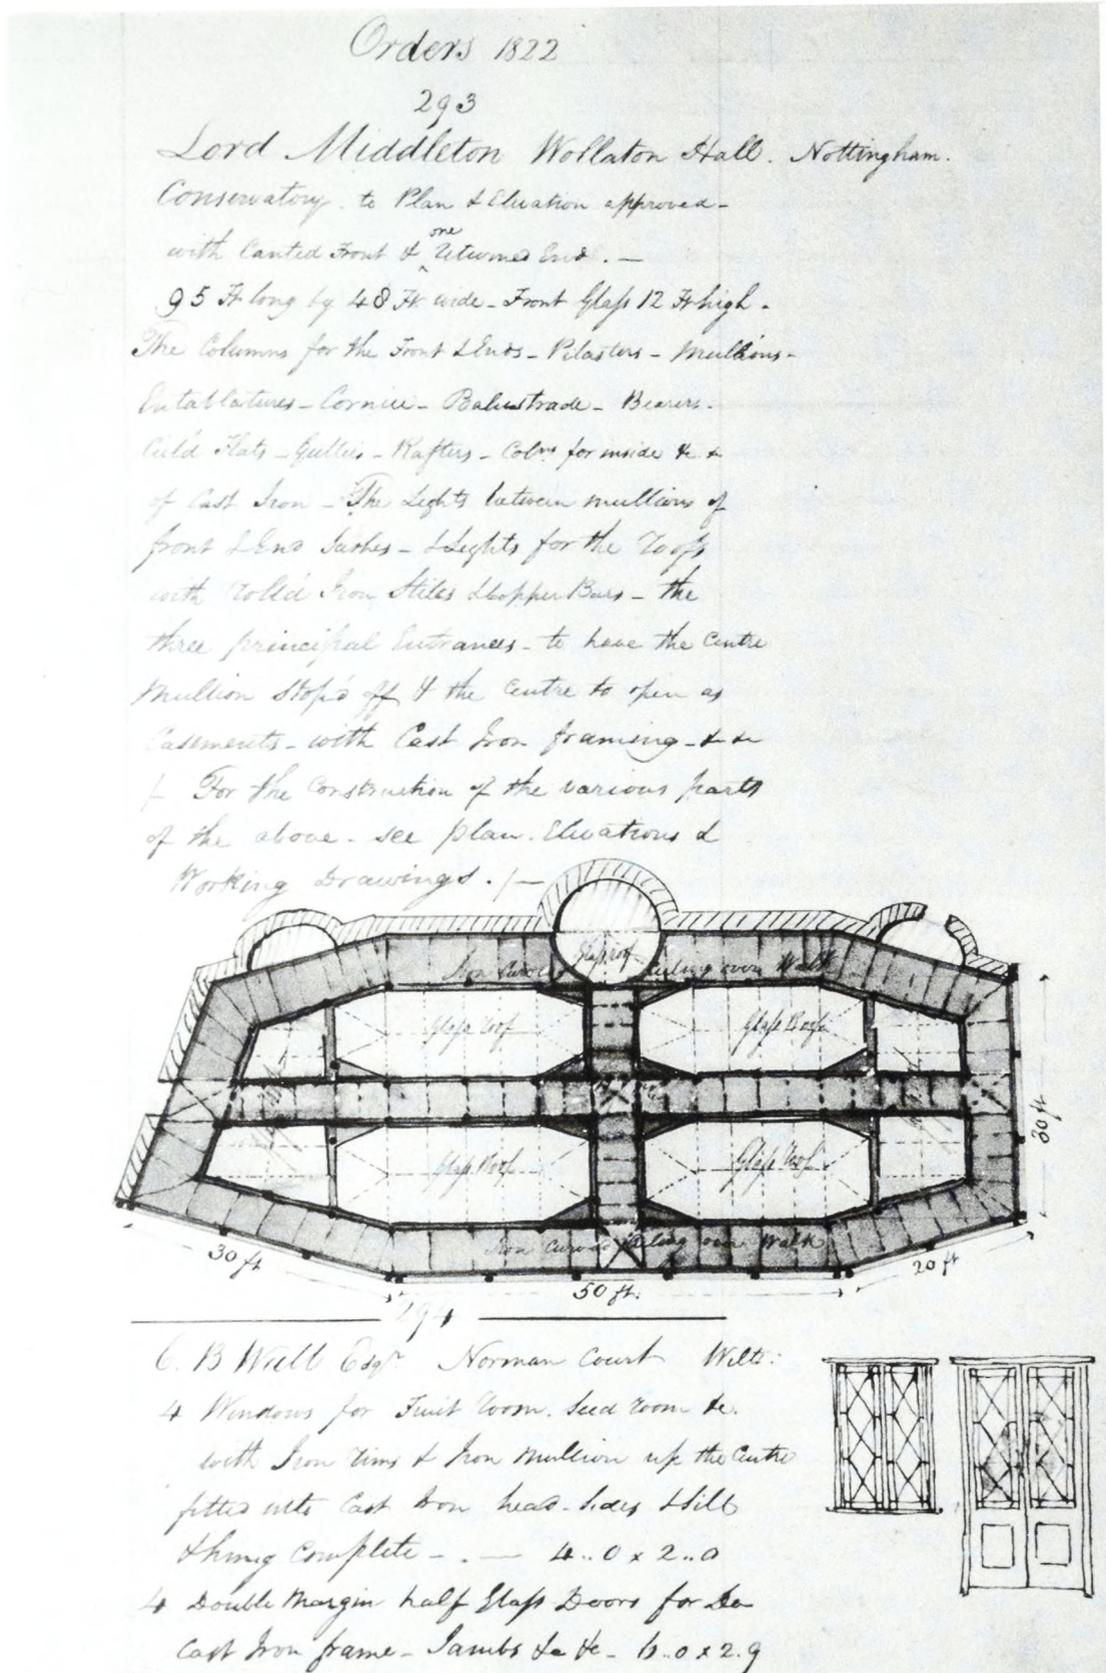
Wollaton Hall, Nottingham: Camellia House, plan from Jones and Clark Order Book, Vol. 1, Order 293. (Summer 1822)
